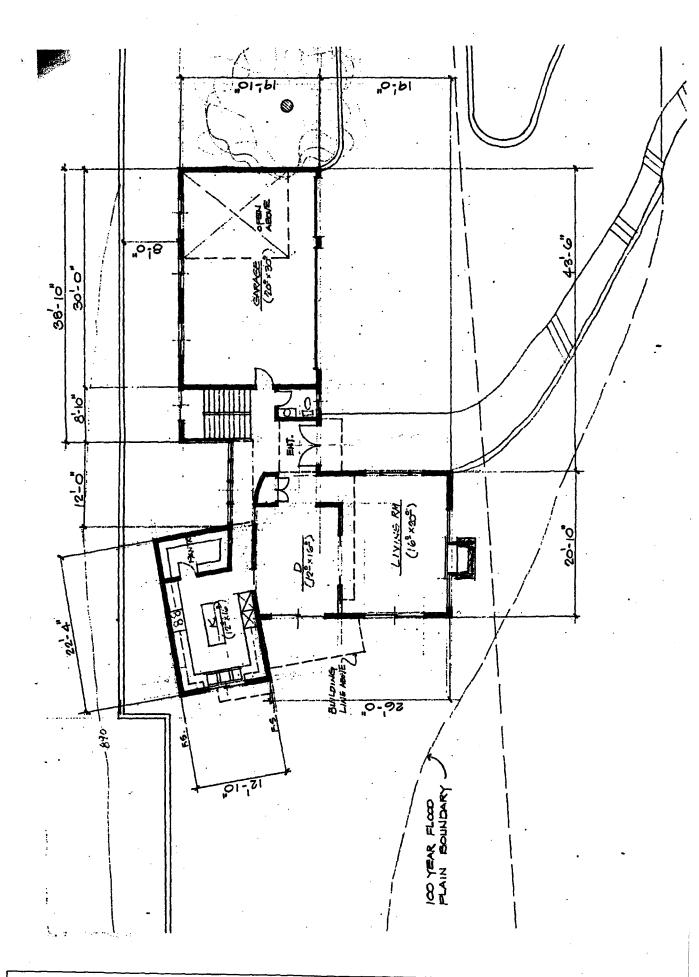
CDP 4-97-233 (Reif) Floor Plan
